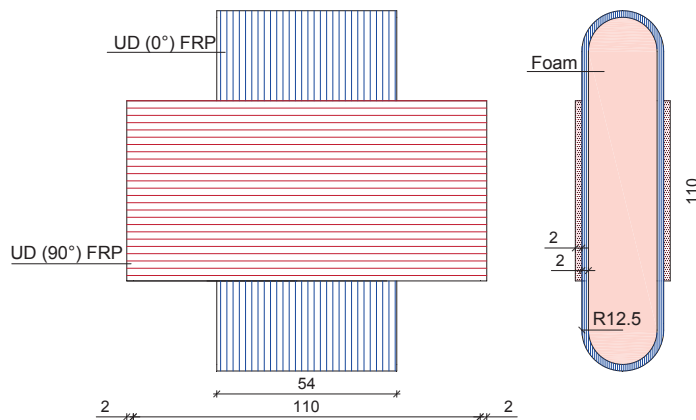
Preliminary specimens, side view and cross section (dimensions in mm).
